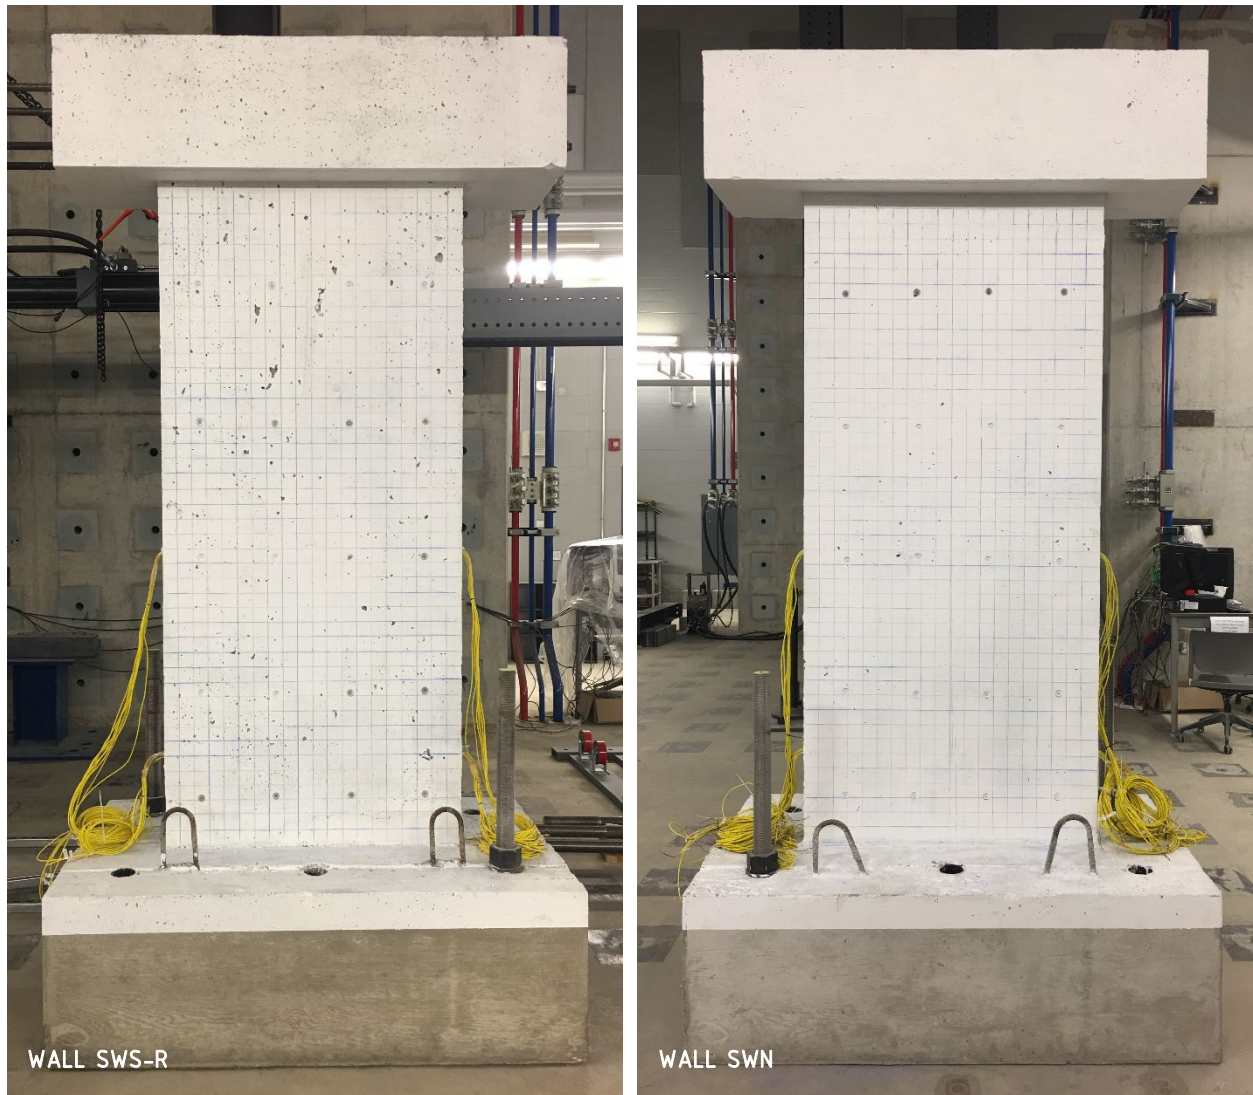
Walls prepared for experimental testing: Wall SWS-R (left); and Wall SWN (right).
